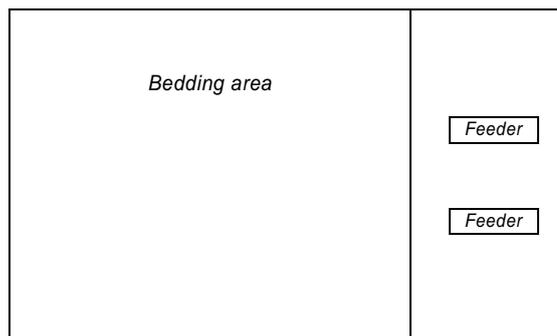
DLH floor plan with bulk multi-space dry feeders generally at the eastern end (not to scale).
